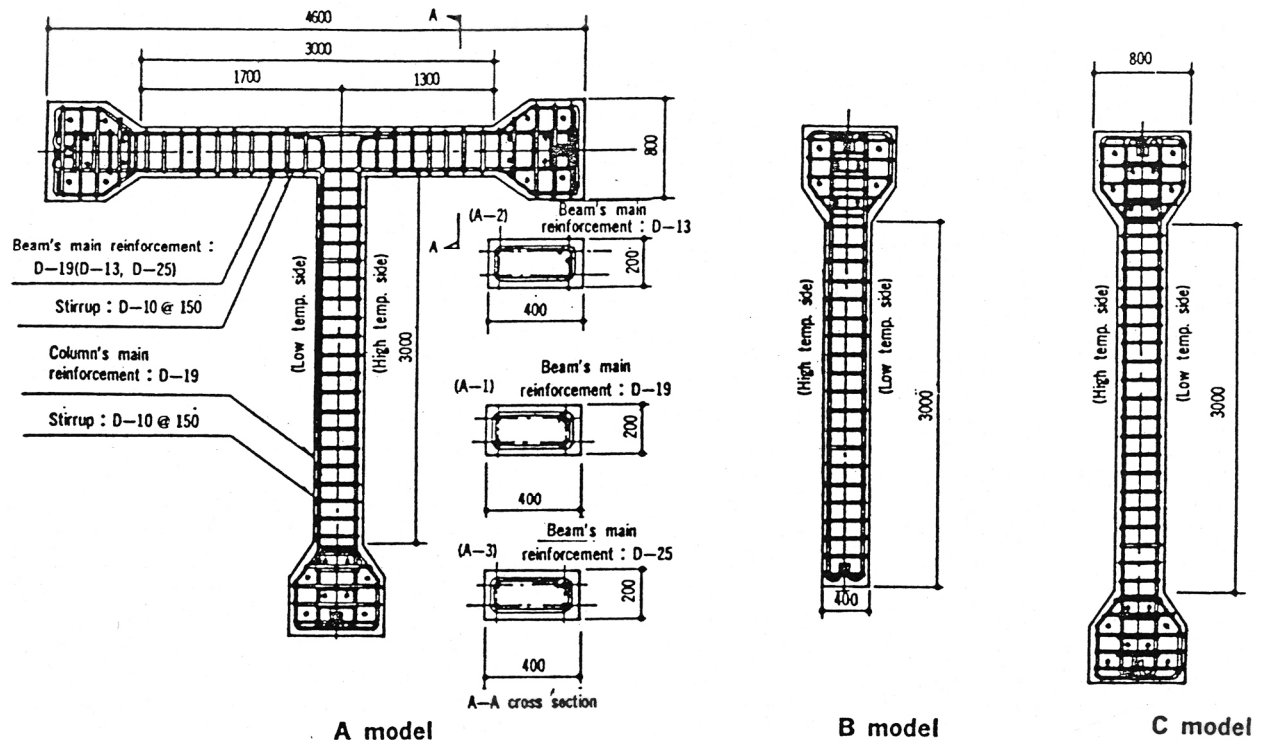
Test articles used to demonstrate the decreased trend of bending moments and axial forces due to cracking and creep in RC structures. *Source:* G. T. Ikoma and N. Tanaka, "Restraining Force and Moment of Reinforced Concrete Beam Column Under a Sustained Long-Term Temperature Crossfall," Vol. H, *Trans. of 9th Ind. Conf. on St. Mech. in Reactor Technology*, pp. 201–208, Lausanne, Switzerland, August 17–21, 1987.
